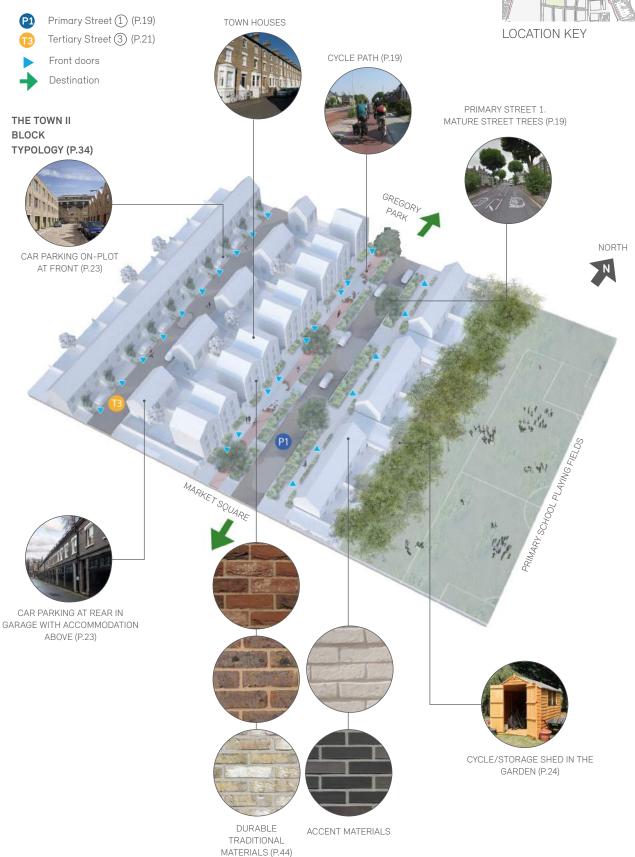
DETAILED DESIGN ILLUSTRATING MANDATORY AND RECOMMENDED GUIDANCE FOR THE TOWN AREA 4. MORLEY STREET, MEWS STREET AND SCHOOL
